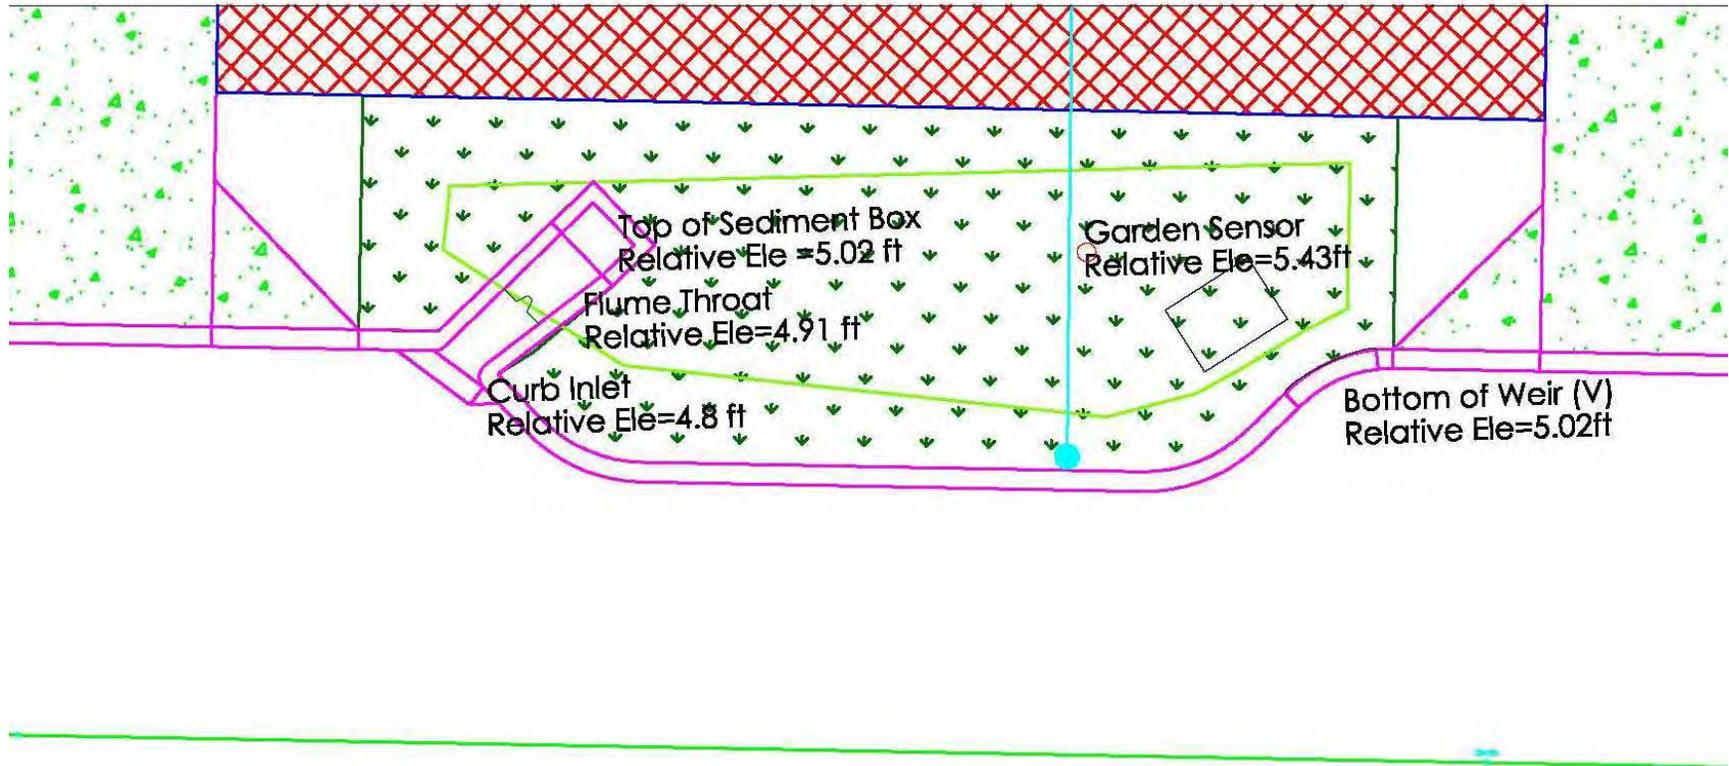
As-built Schematic of Monitoring Installation at Individual GI Solution #1 at 1324 East 76th Street (Curb Extension)
